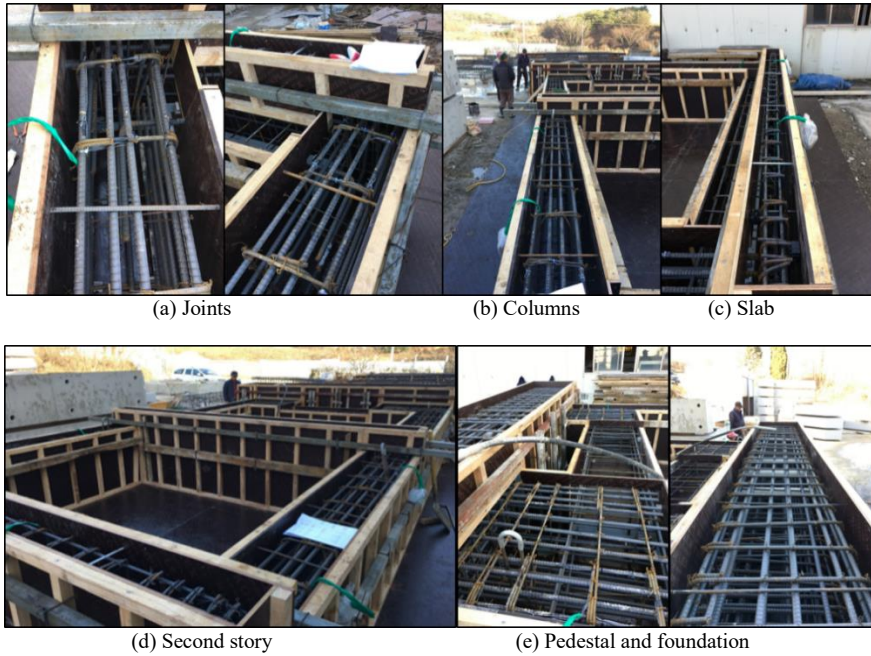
Formwork installation and rebar arrangement of RC frame specimen
